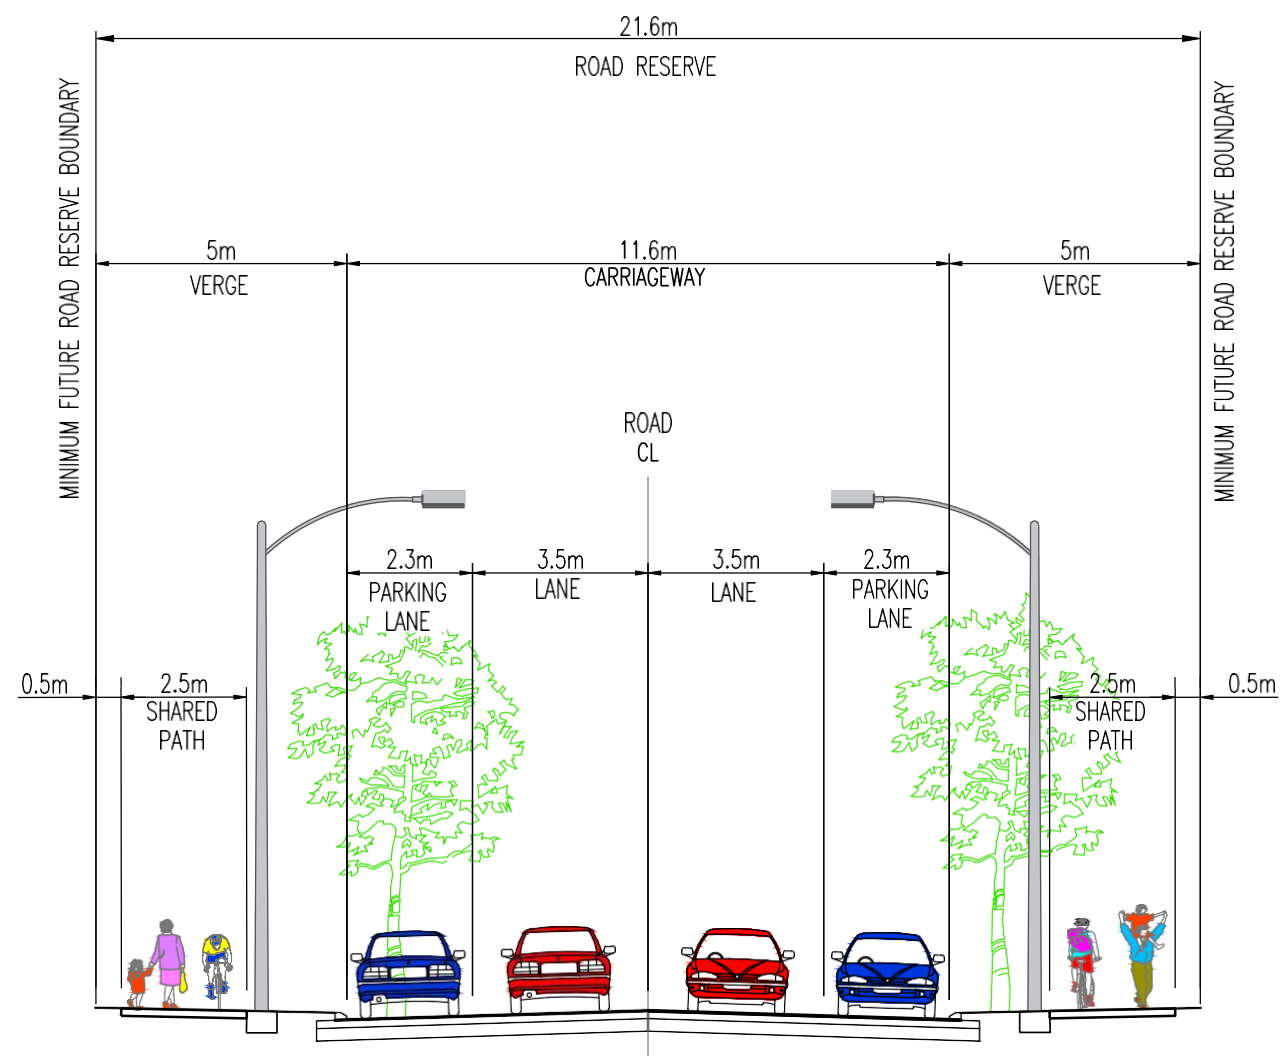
CROSS SECTION OF NEIGHBOURHOOD CONNECTOR B
